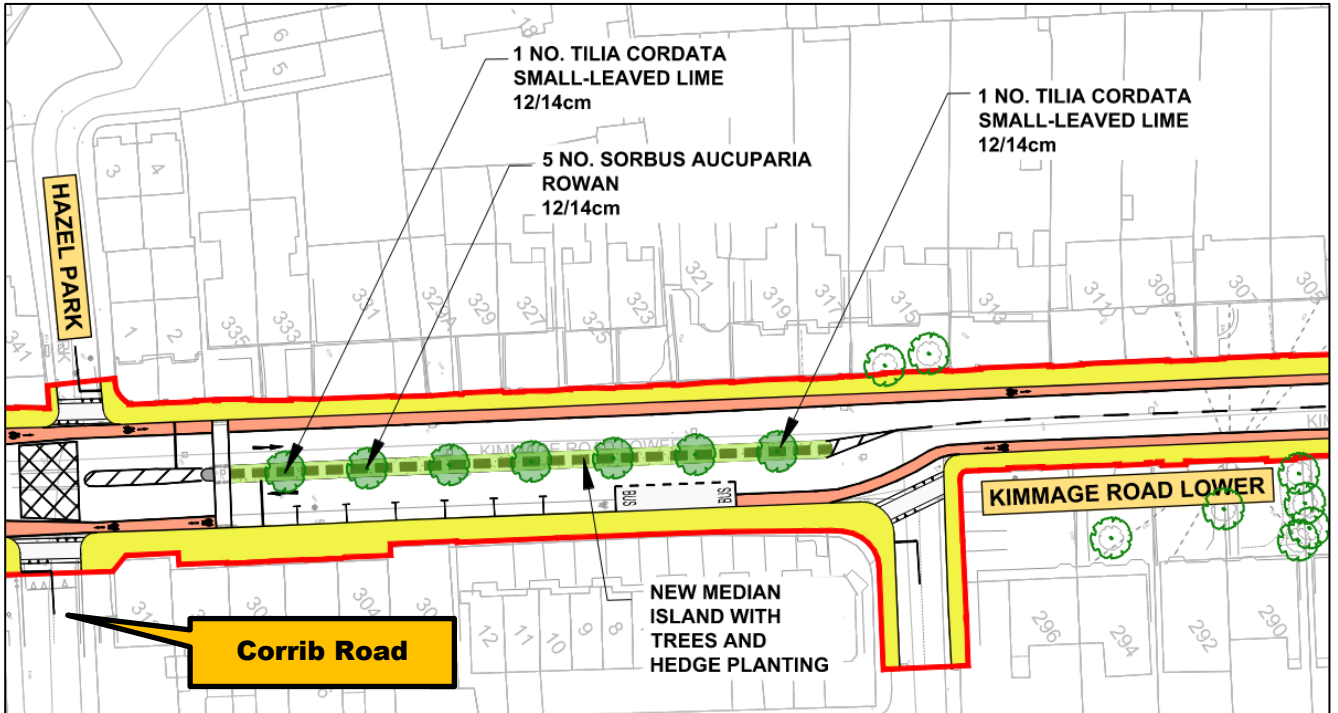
Proposed Urban Realm improvement on Kimmage Road Lower at Corrib Road (part of)
